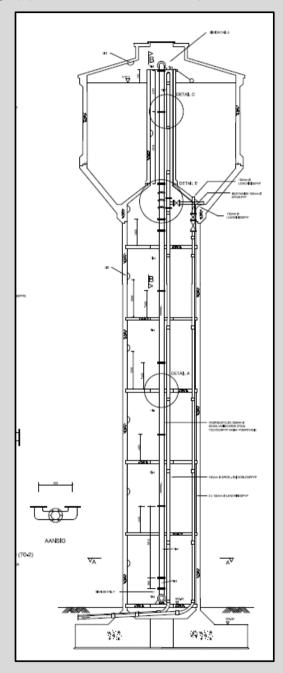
Typical design for side elevation of the water tower which is similar to the existing Municipal Pressure Tower on the corner of Olympic/Beach Roads.
